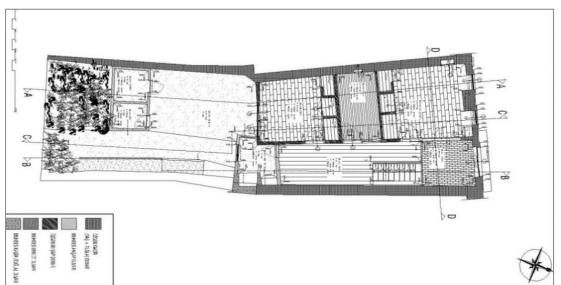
Nurten Terlikçi House upper floor building survey plan (Created by the author)
